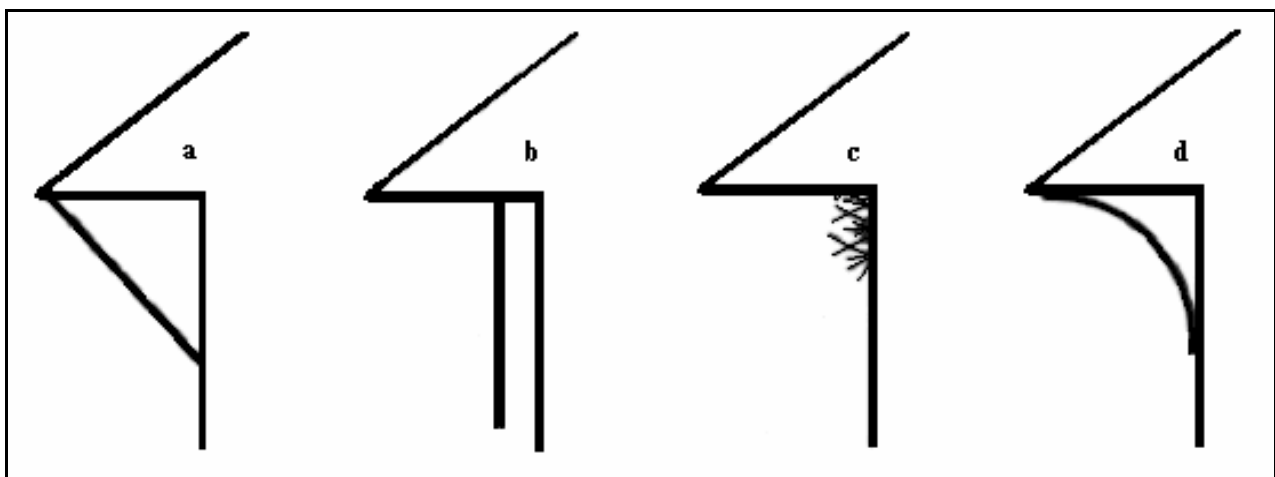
Four methods used to deter Swallows from roosting and nesting under eaves a). netting attached to eave and down the side of the building, b). a curtain of netting hanging down under the eave, d). metal projections mounted at the junction of the eave and wall and d). a fiberglass panel mounted to form a concave surface (Gorenzel and Salmon 1994).
